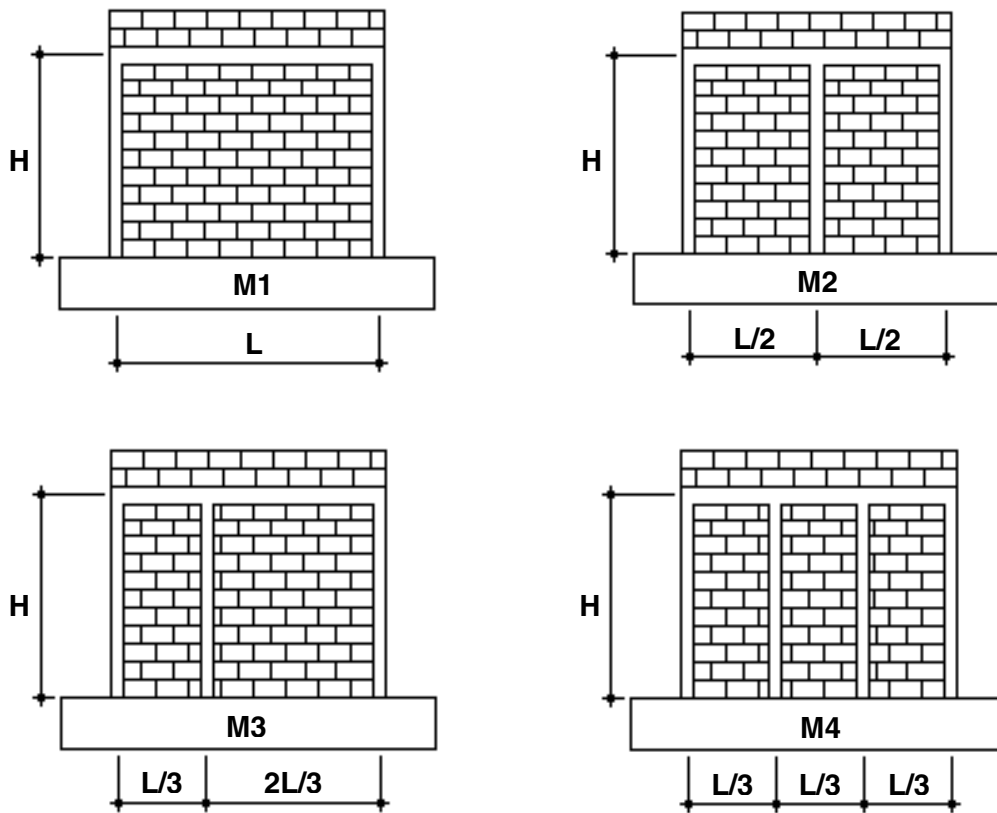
Configuration of specimens M1, M2, M3 and M4.
